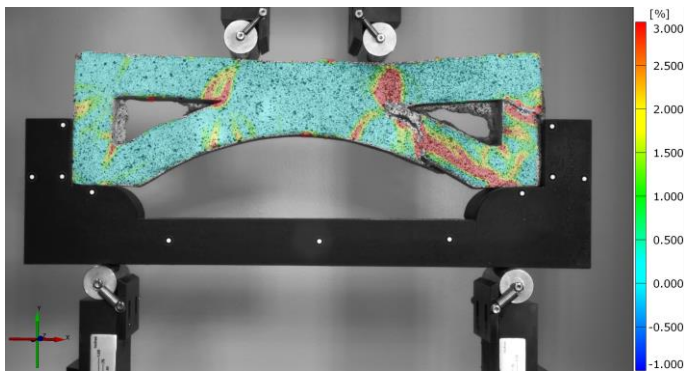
Major strain field of Specimen CL 3D-5 after the critical failure crack has formed in addition to microcracks
